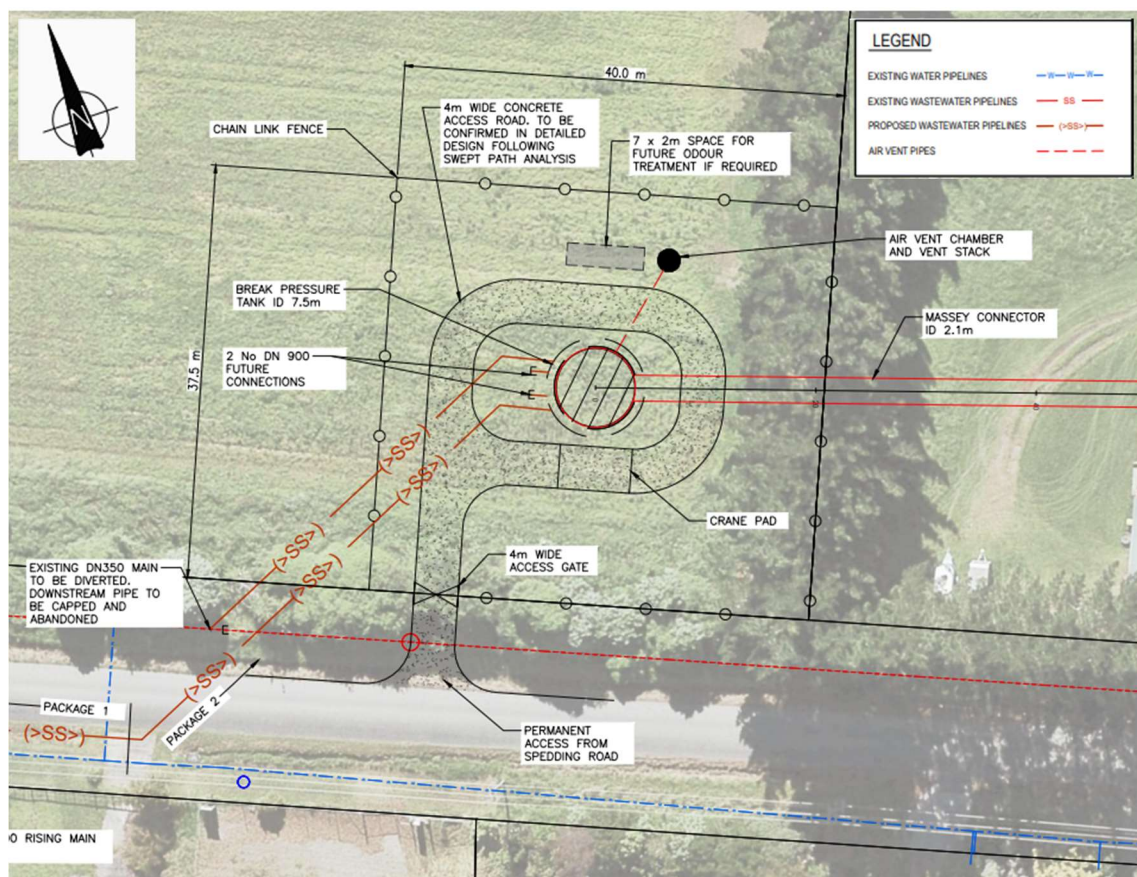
Break Pressure Tank Site Layout 8 Spedding Road
